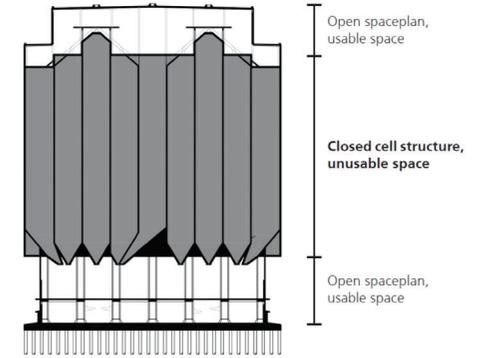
General vertical layout of the Maassilo, with open spaces on the ground- and top floor and closed off silos in-between.
